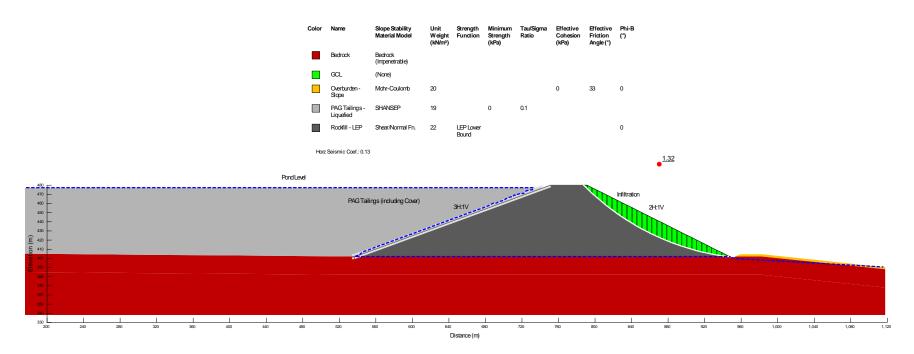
CDF South Cell Perimeter Dam, Typical Section – Stability Analysis of Design Earthquake Loading (Pseudo-static) Condition
